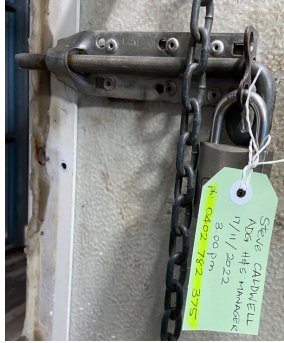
Terminal roof access door is locked in the open position when you access the roof
